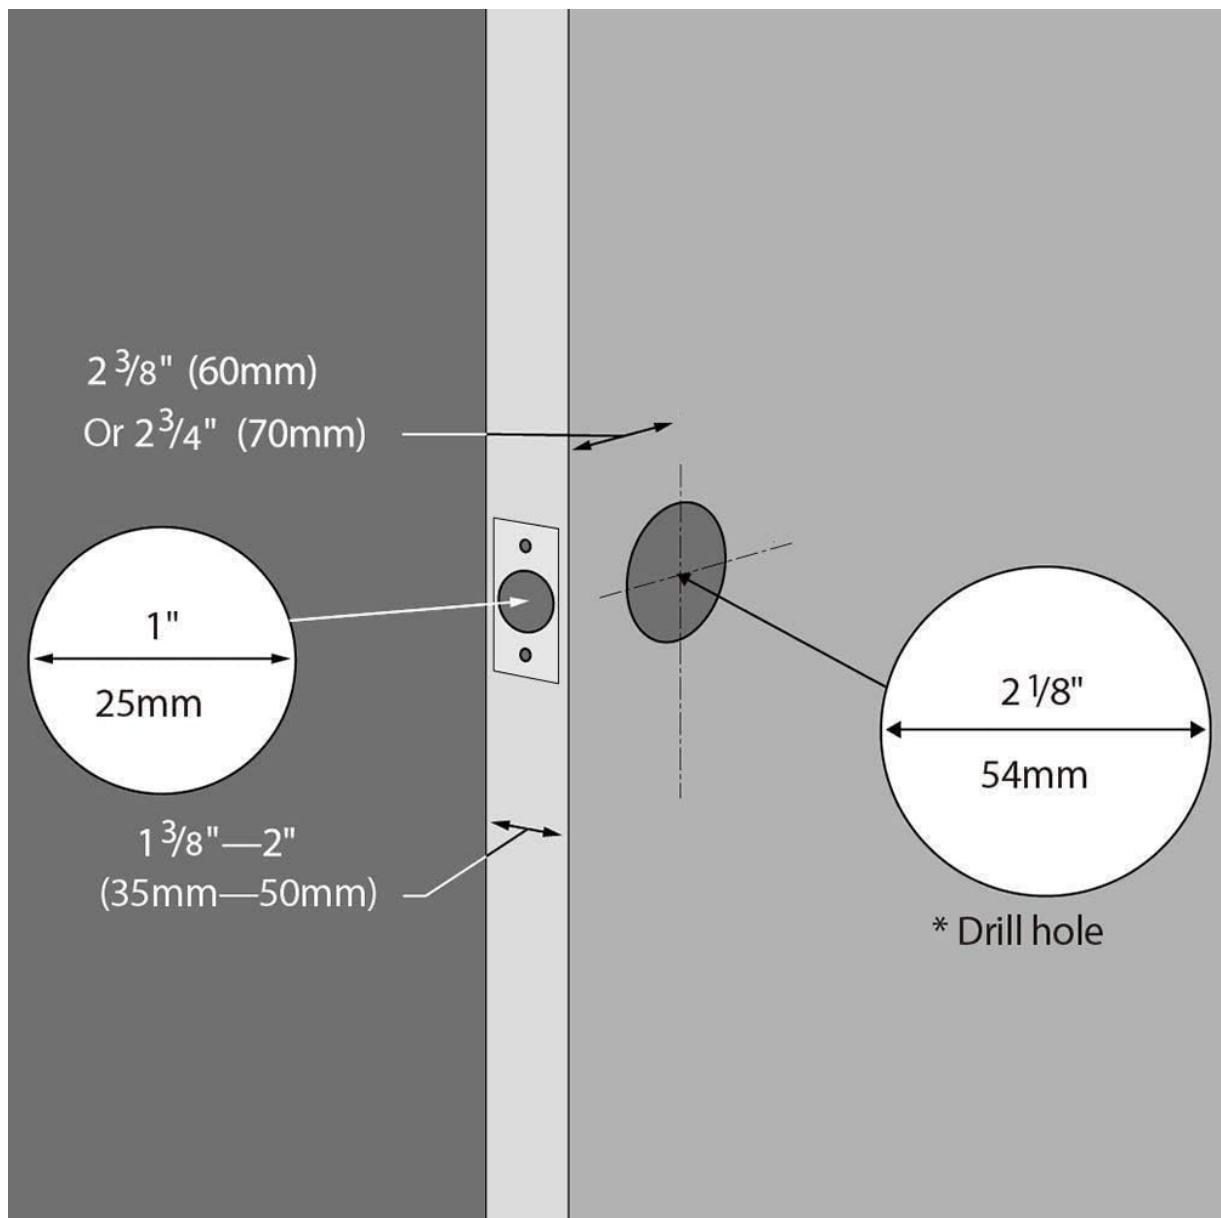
Diagram detailing the required door preparation measurements, including face hole and latch hole dimensions.
